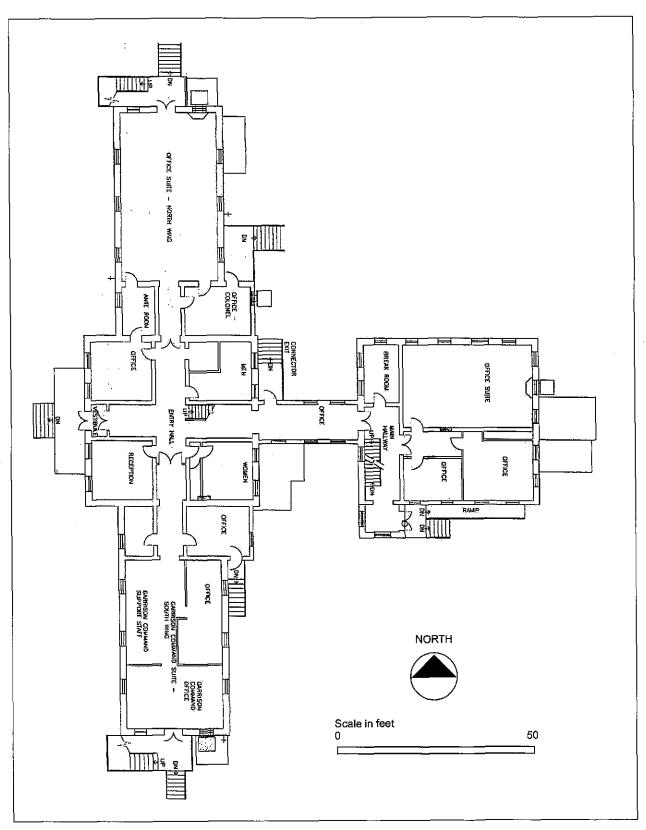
First floor plan, 2008. Source: HNTB Corporation.
